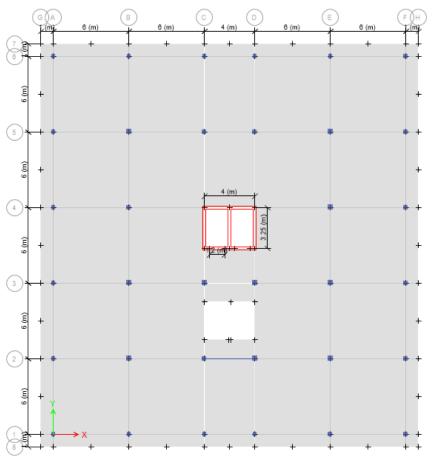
Prototype Framing Plan of flat plate floor supported by square columns
